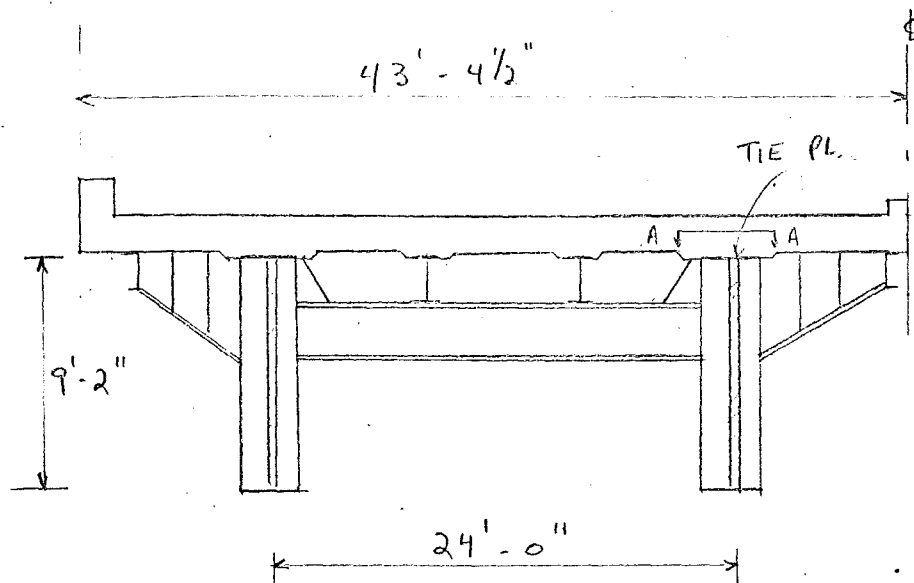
Cross Section of Columbia-Wrightsville Bridge
